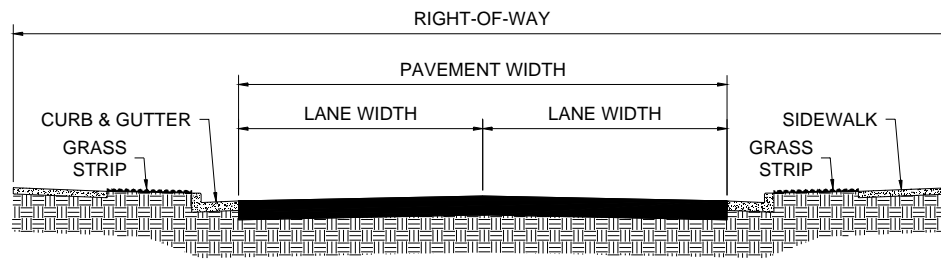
Typical Street Sections: Street with Curb & Gutter
